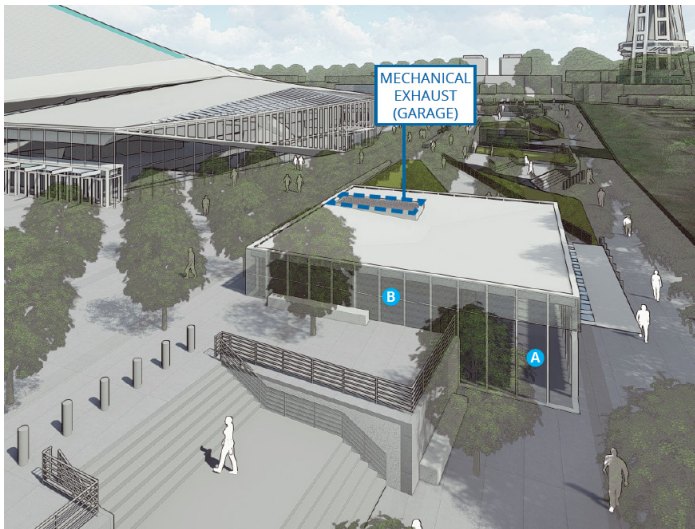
Proposed design for structure near 1st Ave and Thomas St.
